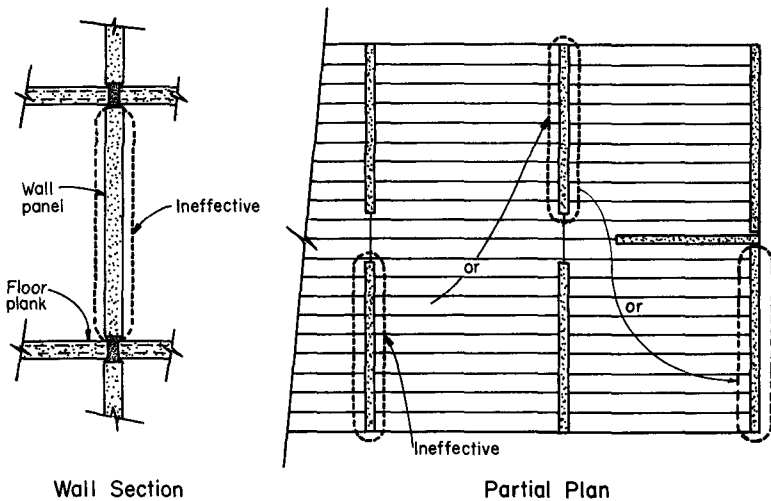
Extent of assumed maximum wall damage under abnormal loads.
